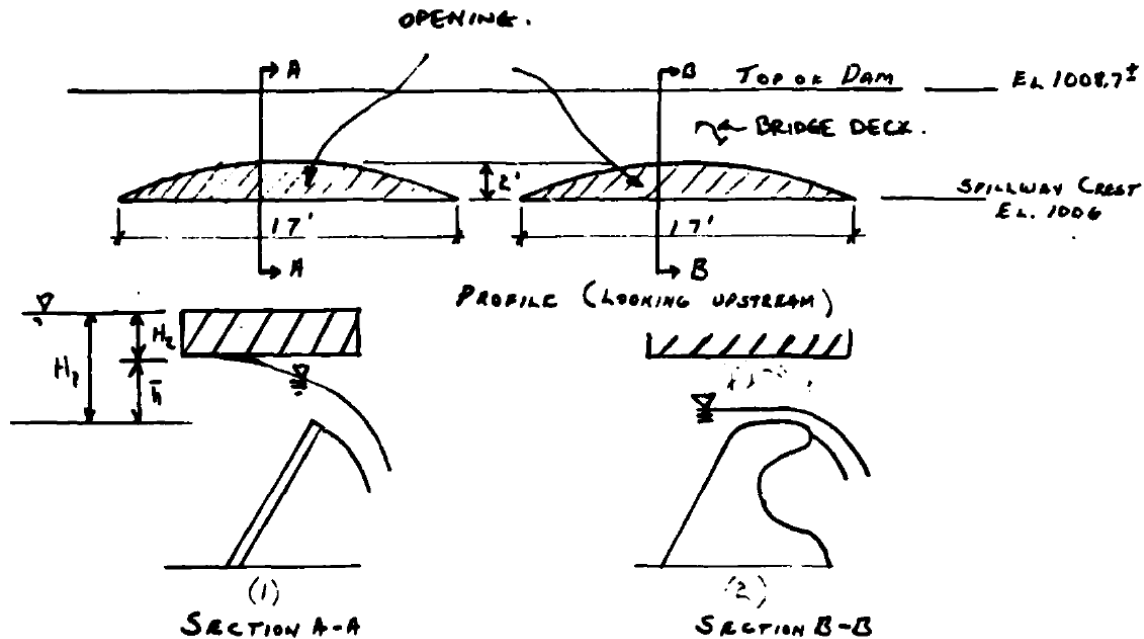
Spillway Capacity Drawing from 1979 Dam Inspection Report Indicating Spillway Crest Labeled at Elevation 1006 ft
